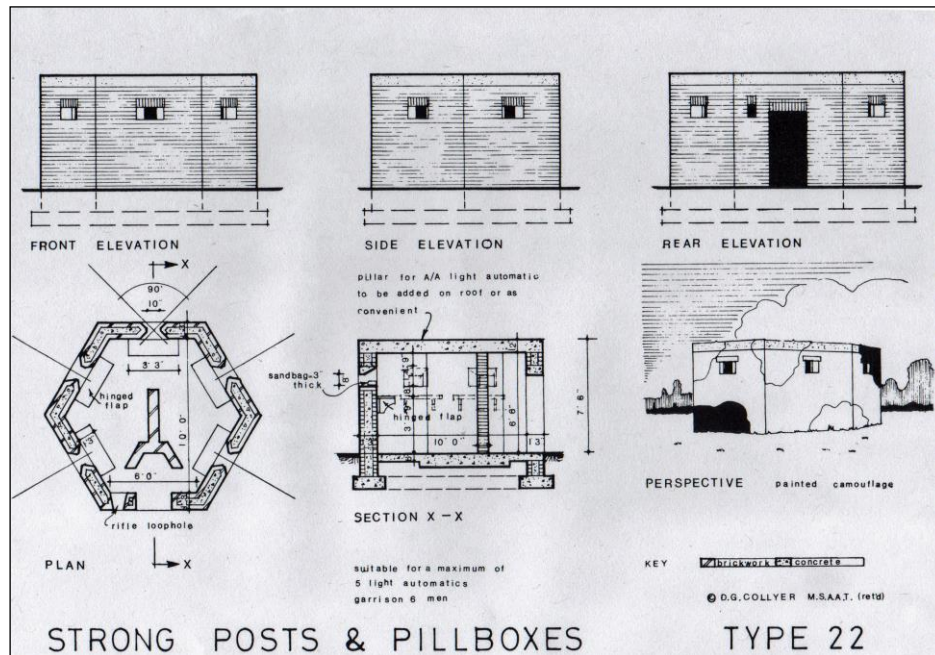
Designs, dimensions and elevations for FW3/Type 22 Pillbox
